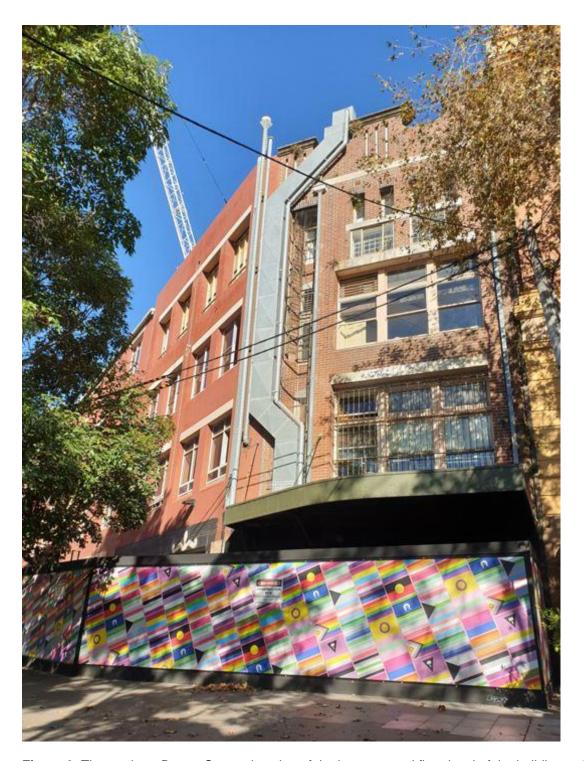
The northern Burton Street elevation of the lower ground floor level of the building at 56 Oxford Street, Darlinghurst, viewed from the northern side of Burton Street, looking south
